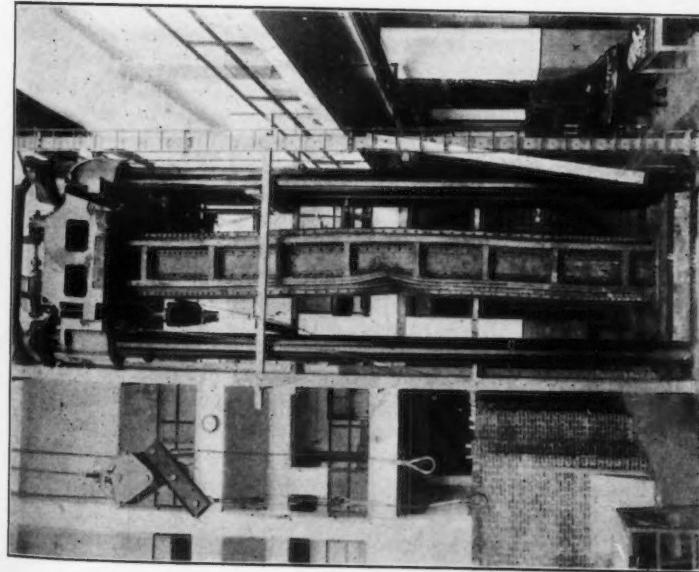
TYPICAL FAILURE, A SILICON STEEL TEST COLUMN.
